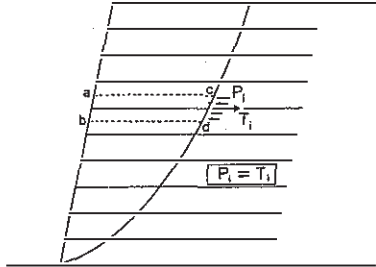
Assumed horizontal force equilibrium for a long reinforcement.
